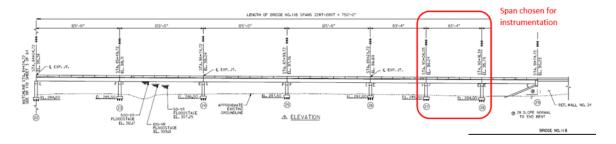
Engineering drawing. Elevation view, bridge Sheet 3 of 64, Bridge 11B plans
